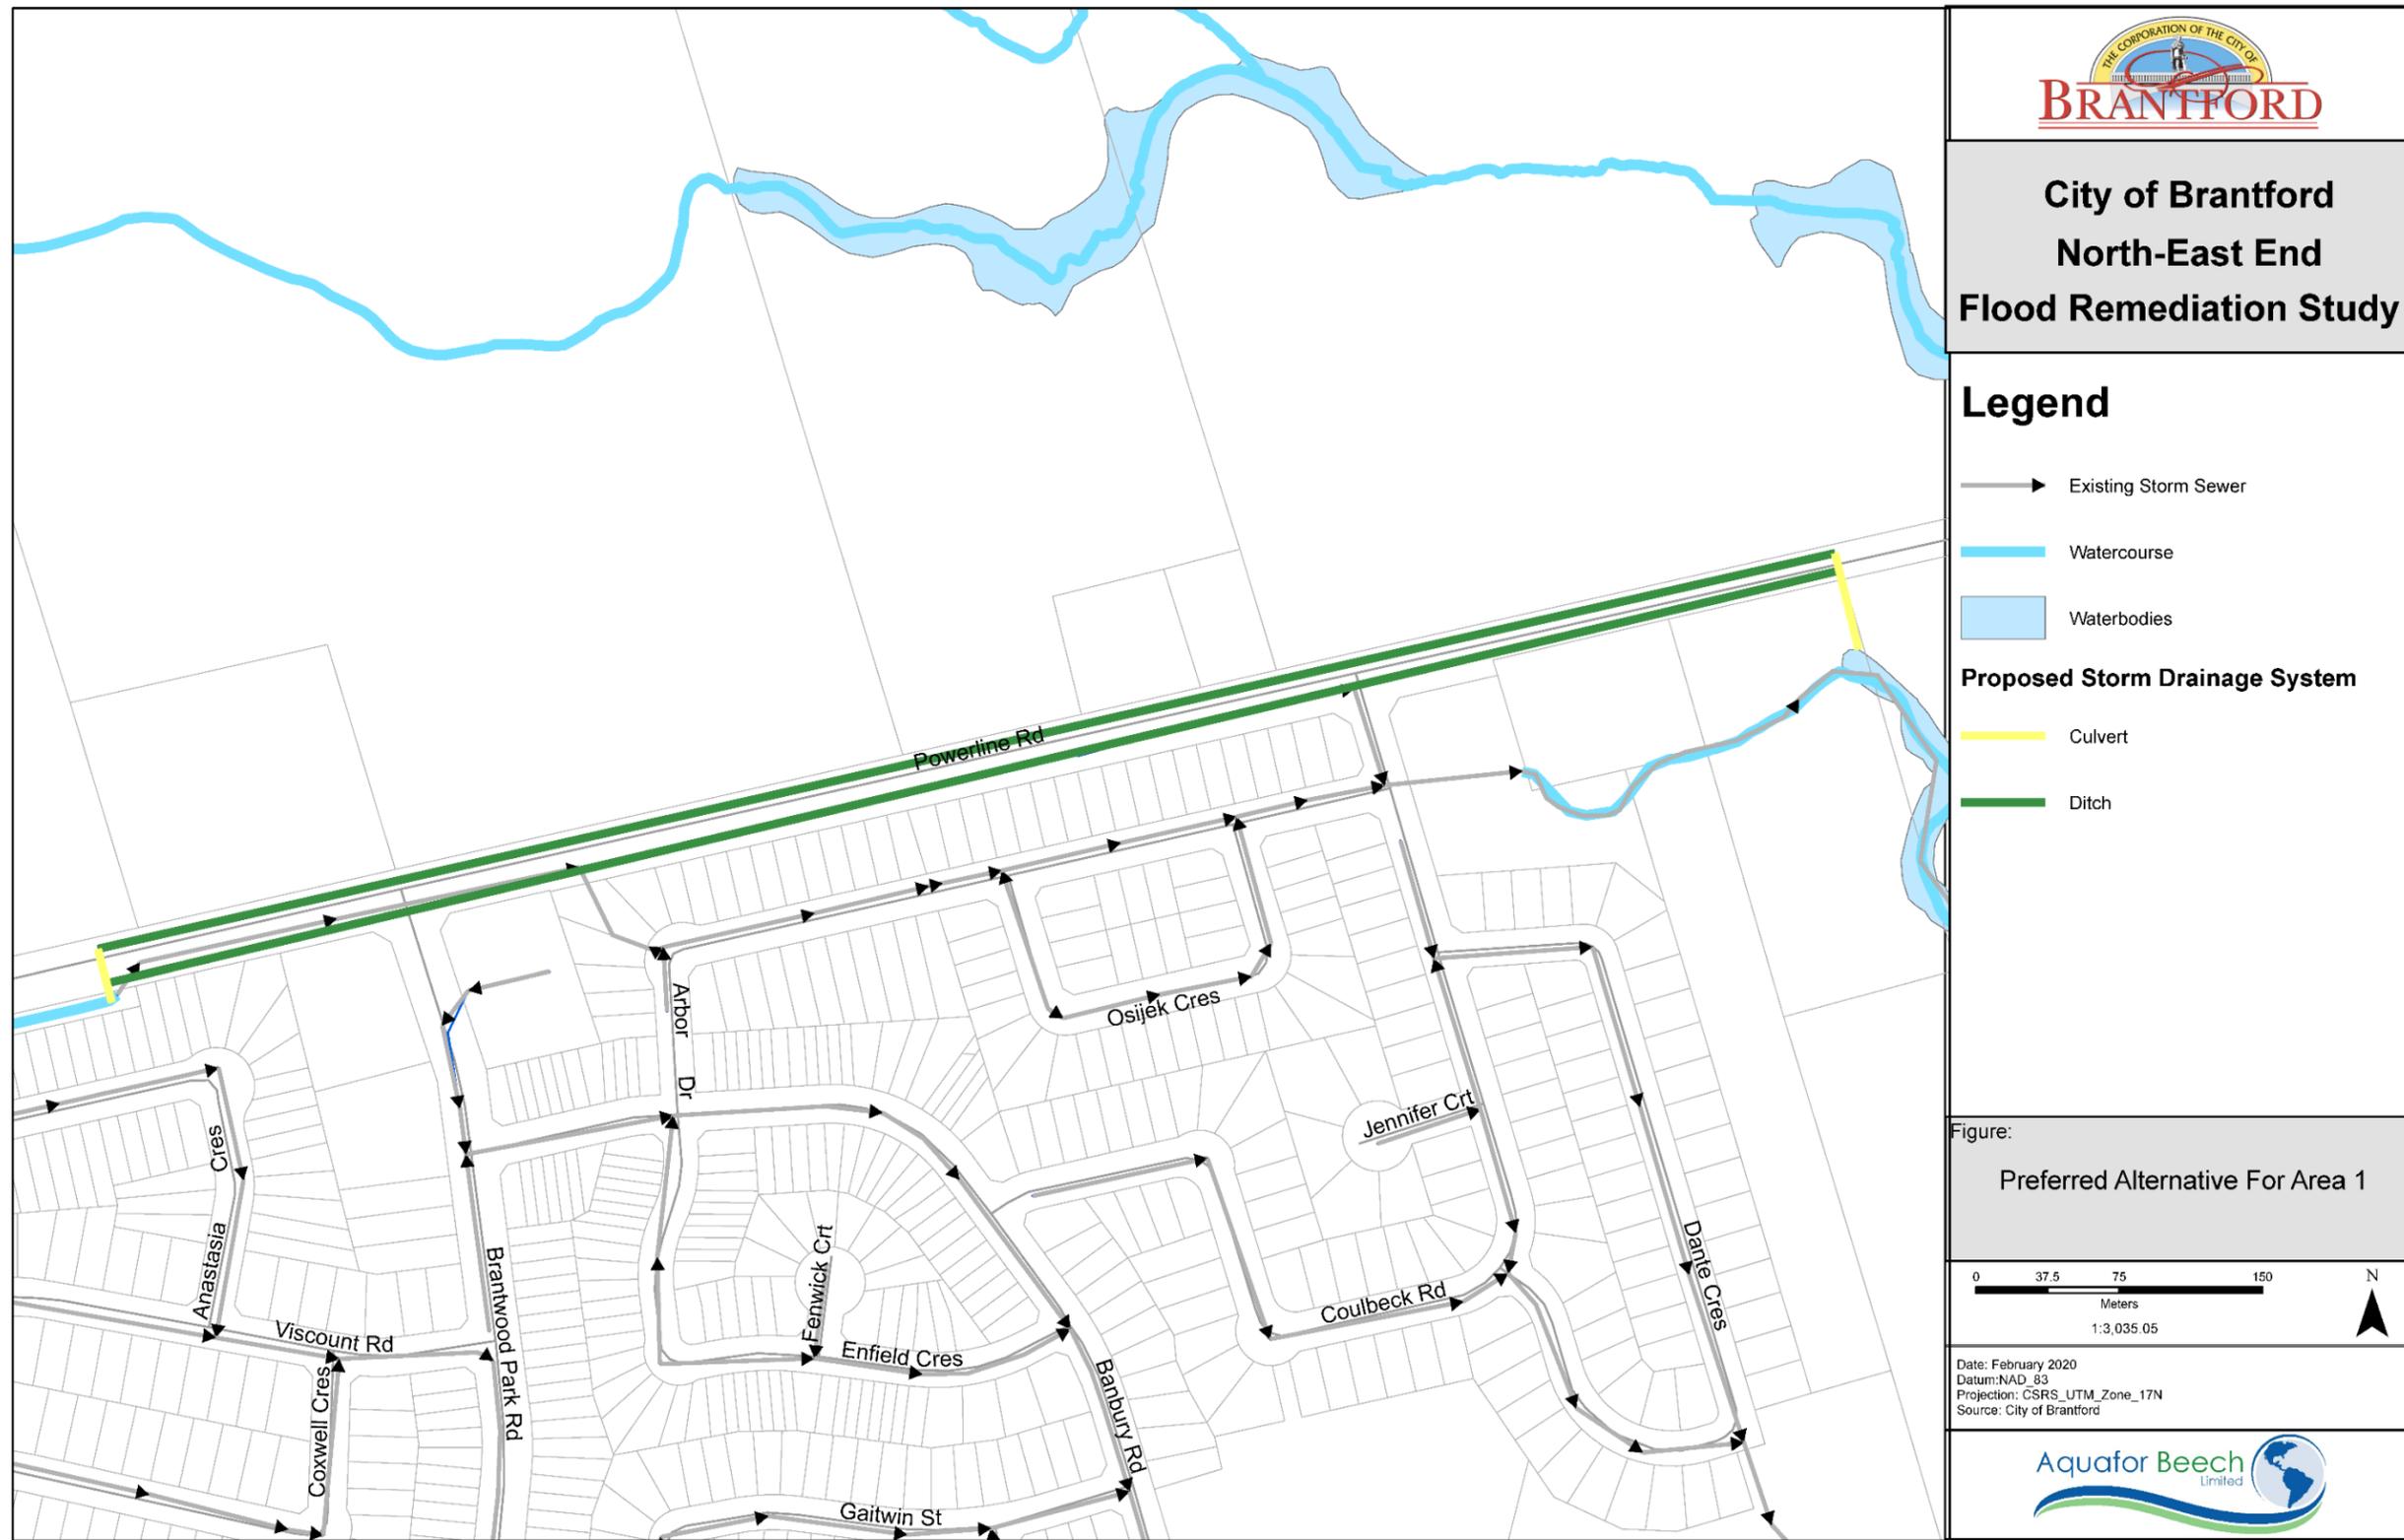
Proposed Storm Sewer Works for Area 1 – Powerline Road
